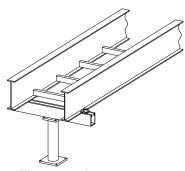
A ELEVATED STRUT TYPE SUPPORT
